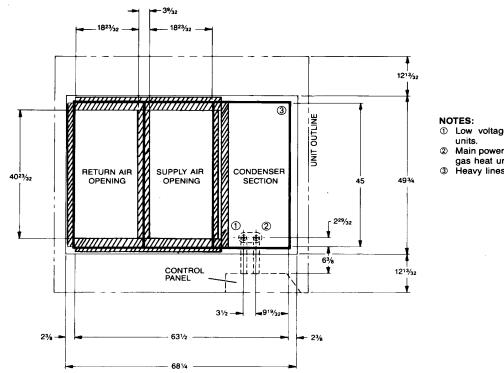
CANTILEVER CURB AND DUCT CONNECTION FRAME KIT (CONDENSER SECTION OVERHANG)
